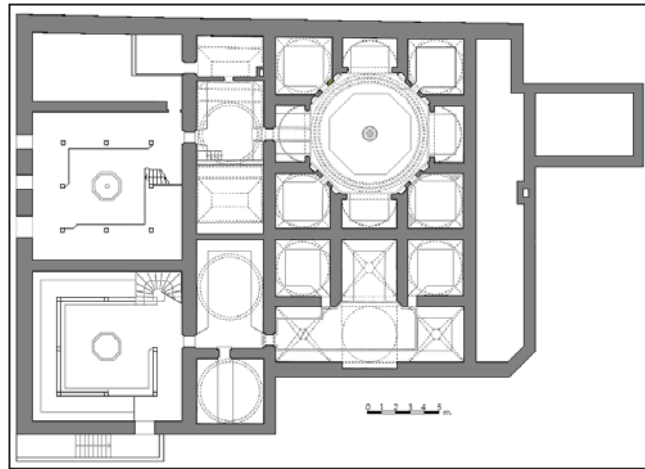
The plan of Sultan Hamam (Akın, 2009)
